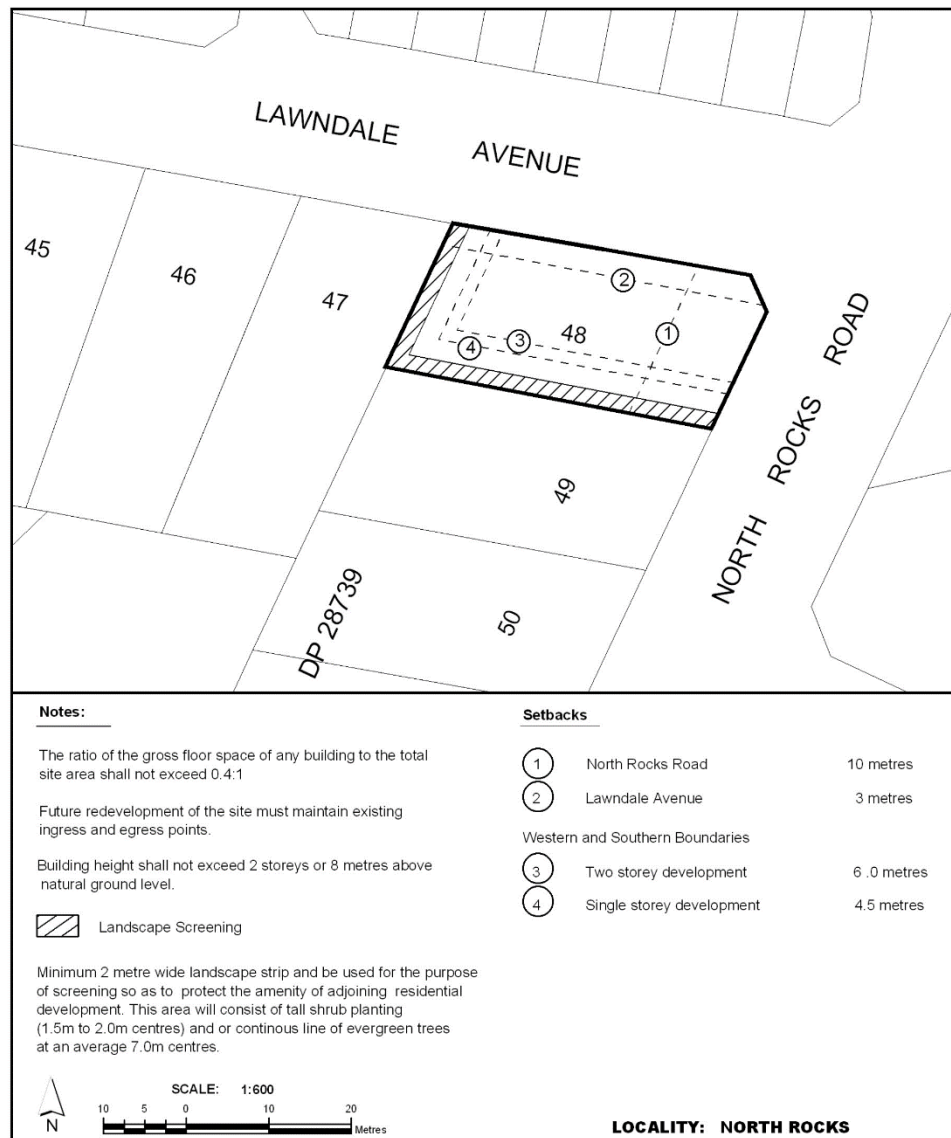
Setback requirements for land on the corner of Lawndale Avenue and North Rocks Road, North Rocks (355 North Rocks Road, North Rocks)
